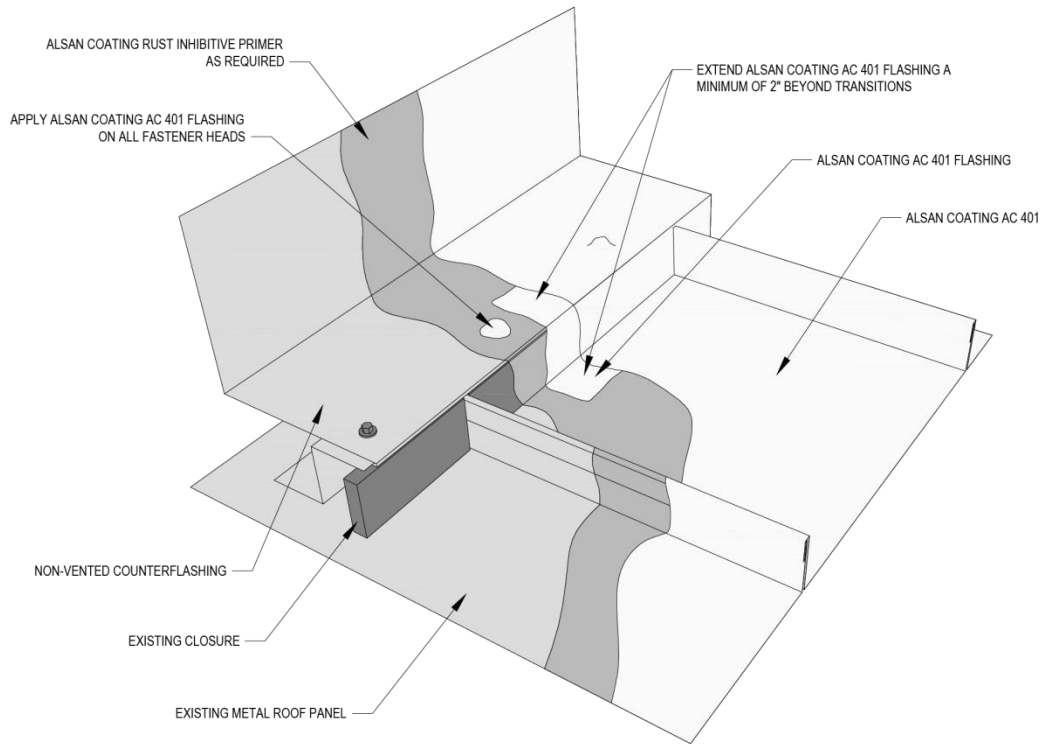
Acrylic Roof Coating Over Standing Seam Metal, Wall/Curb
